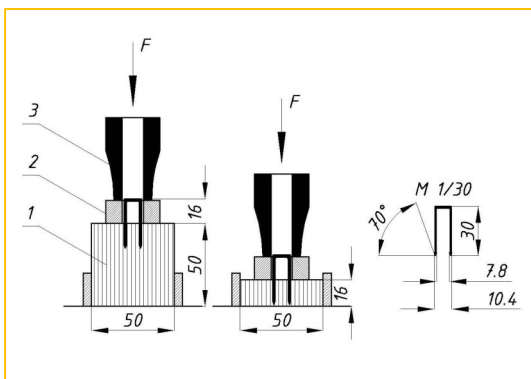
Schematic diagram of nailing the connecting element in the test sample
